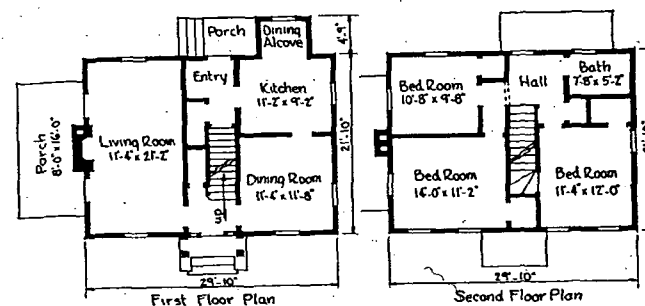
FLOOR PLAN OF SIX-ROOM RESIDENCE^a
